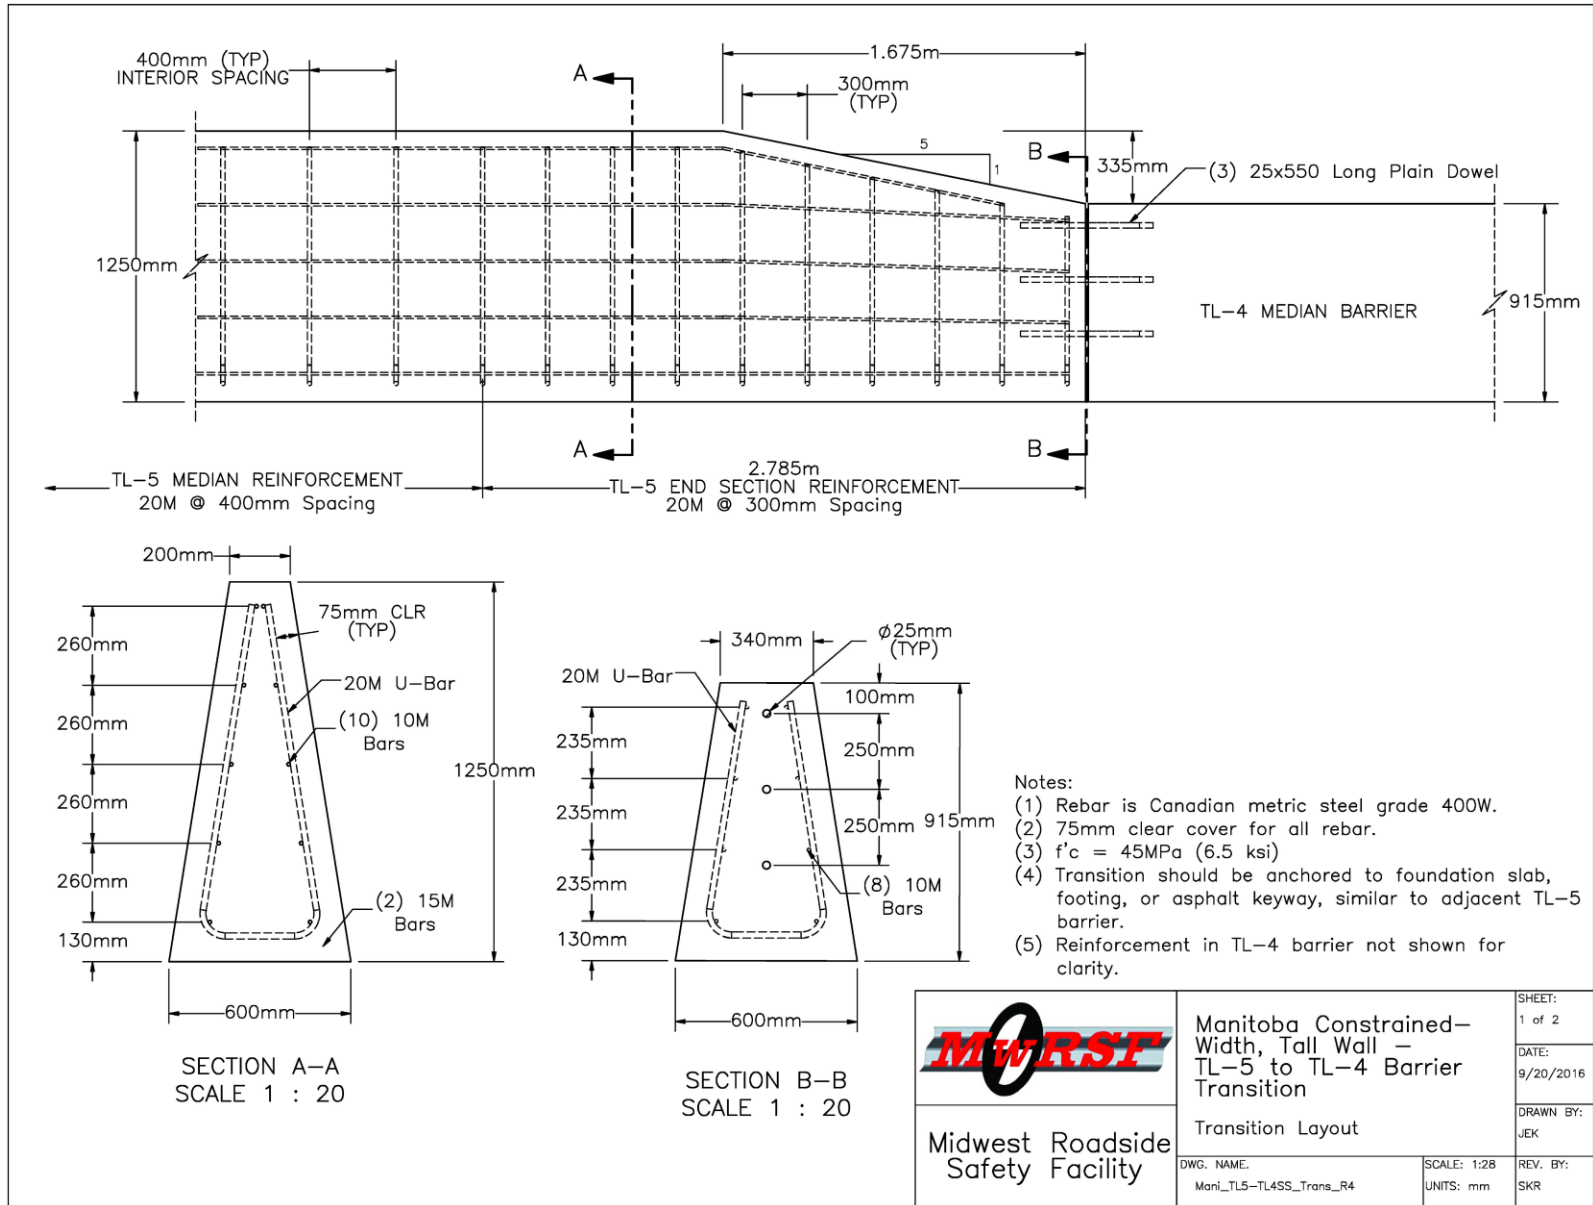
Transition Details, TL-5 Median Barrier to TL-4 Single Slope Barrier
